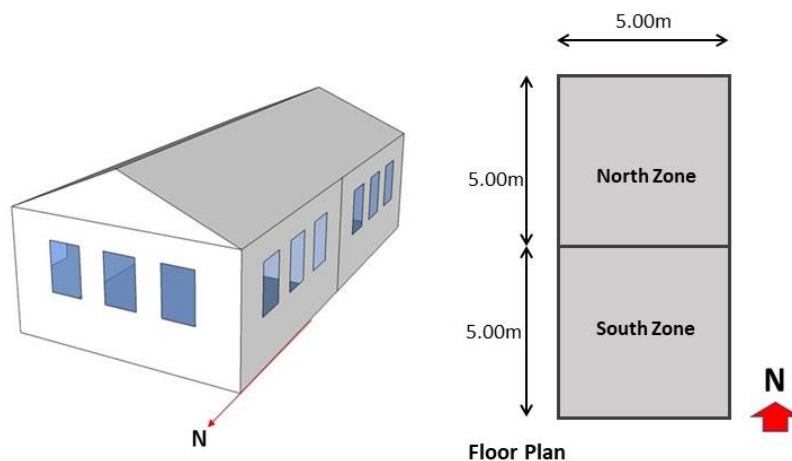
Simple house design (hypothetical model) as for preliminary test
